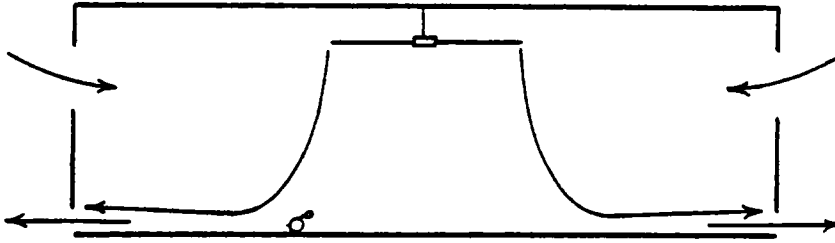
CEILING FAN APPLICATION FOR AIR CIRCULATION AND AIR EXCHANGE.
